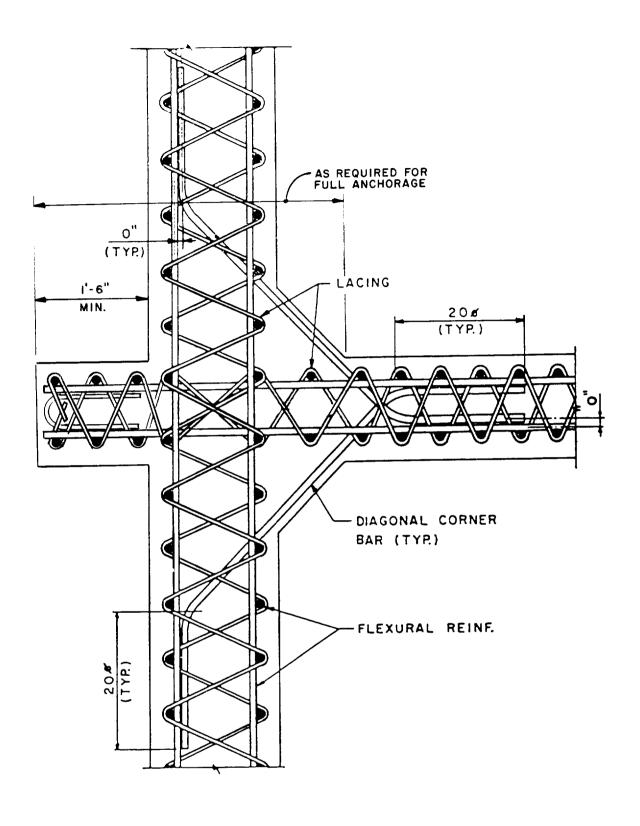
Typical detail at intersection of continuous and discontinuous laced walls
